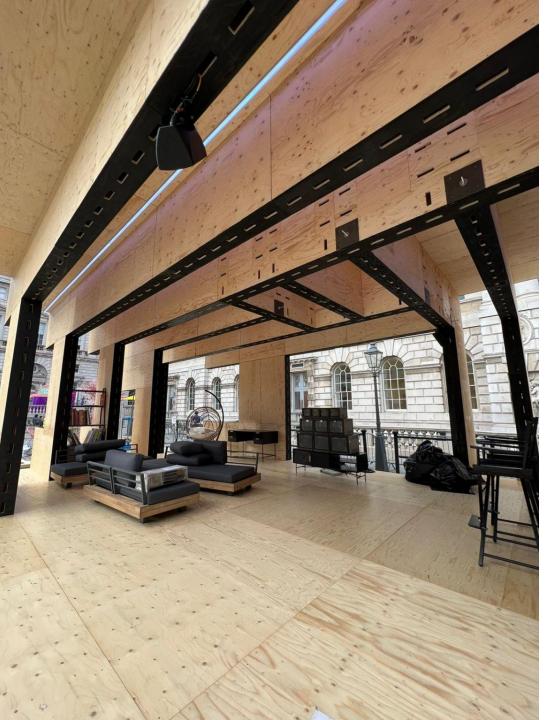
Test 2 – support spanning beam Somerset House structure – THIS BRIGHT LAND
